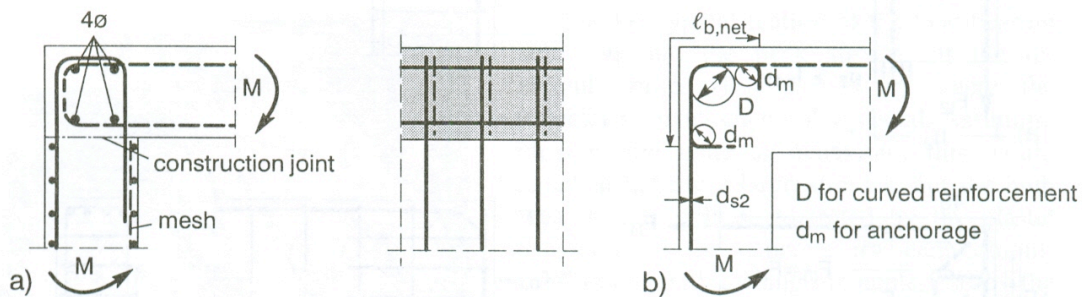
Example of a wall-slab connection with loop reinforcement and hooked bars, respectively.
